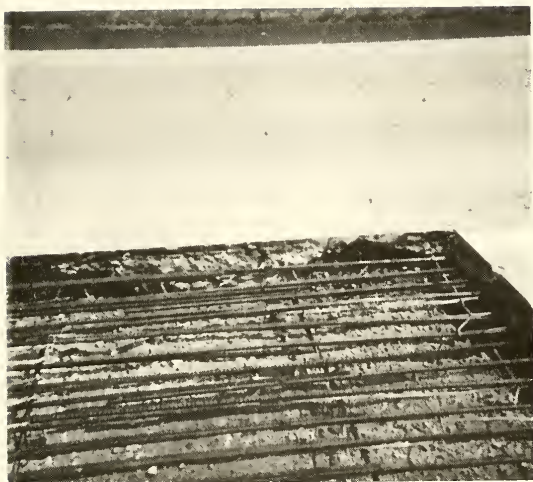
UNCONSOLIDATED CONCRETE PAVEMENT IN PASSING
